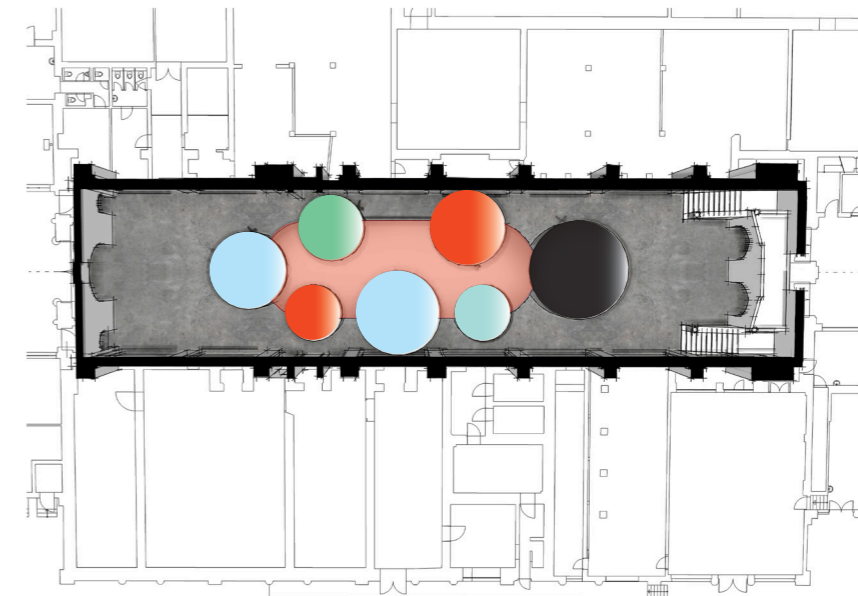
Architectural Plan of the Old Abattoir, ChronoCity (2014) Image by Holl, Büro für Städtebau und Architektur
